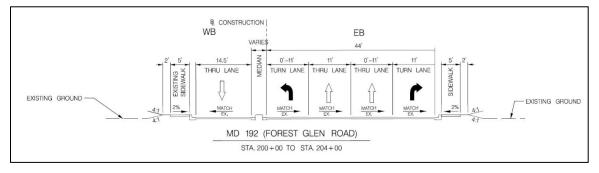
Proposed Cross Section – Forest Glen Road/MD 192 (West Side of MD 97)
